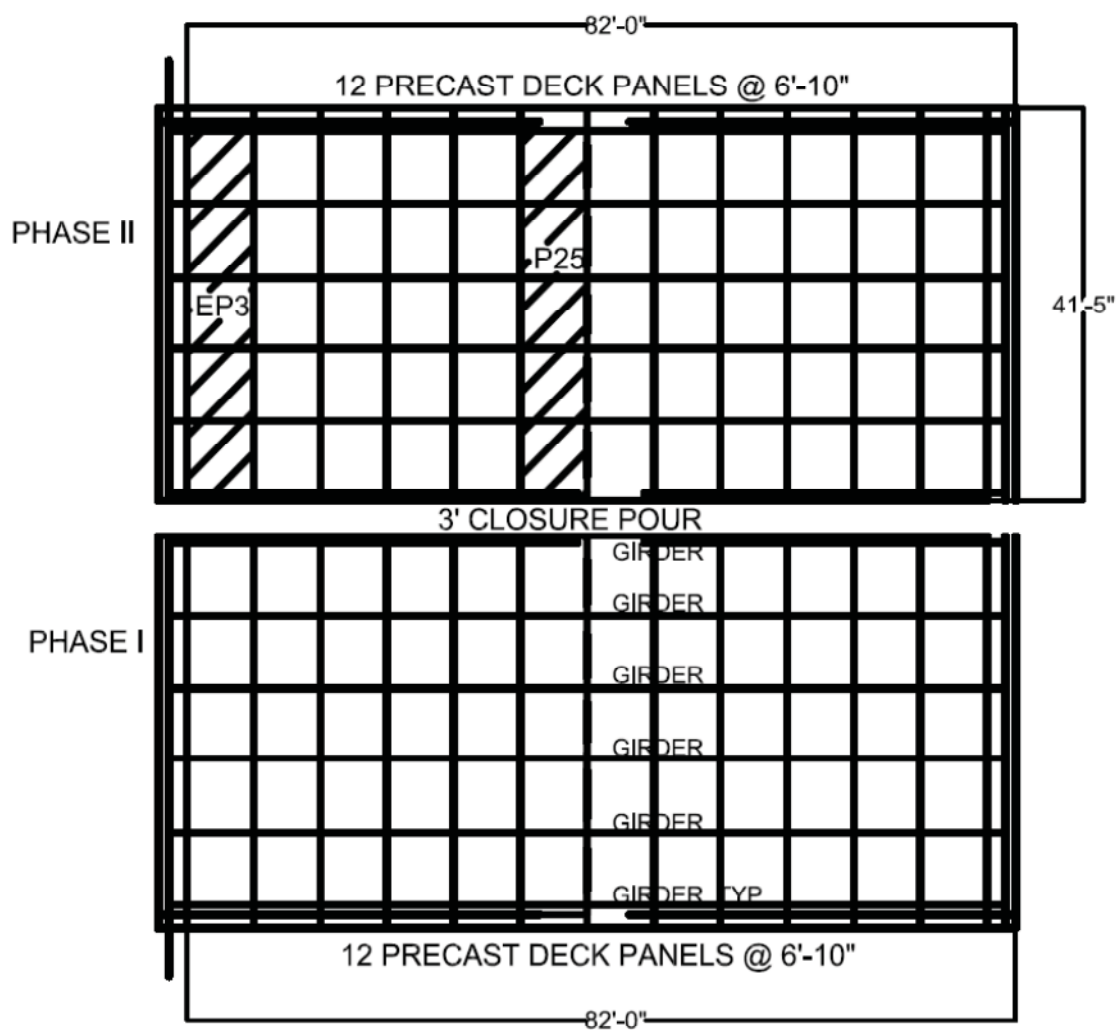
Plan view of Beaver Creek Bridge showing prestressed girders and deck panel
